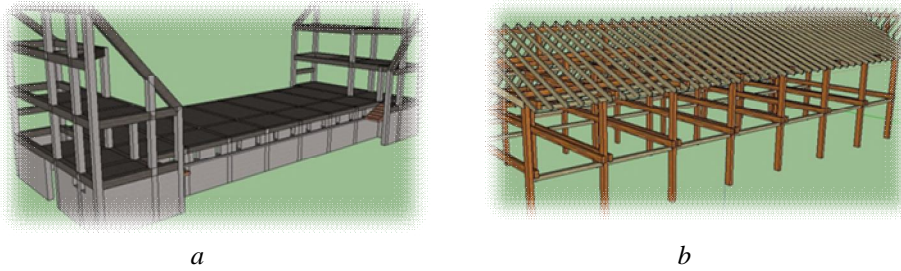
Structural spatial frames made of *a* – reinforced concrete and *b* – glue laminated timber.
